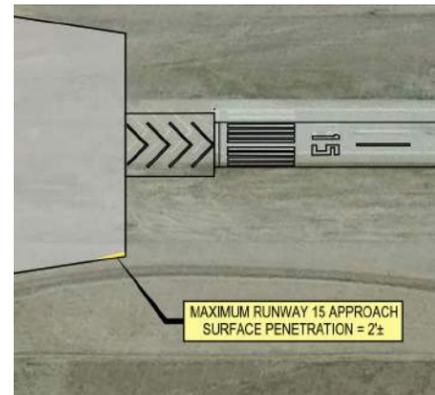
Approach Surface Penetrations - 80' Runway Shift - 3,000' to 5,000' North (Appendix B, Alternatives 6 through 8, Sheet 4 of 4)
